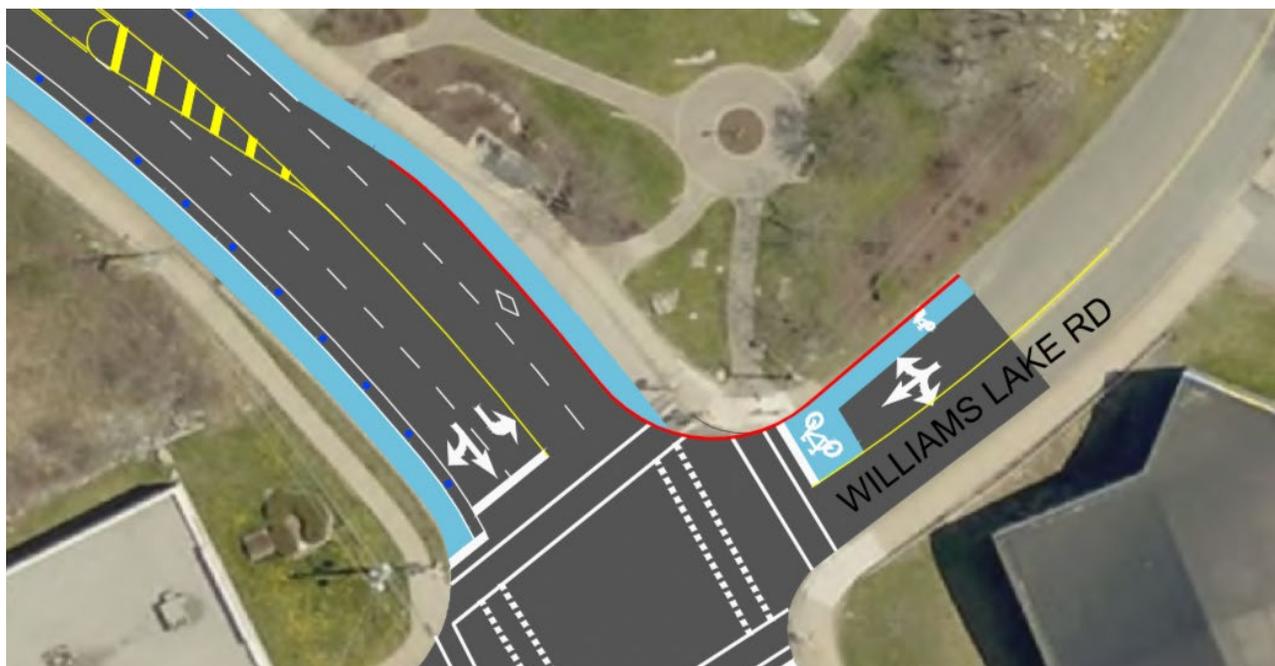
Proposed intersection design at Herring Cove Road and Williams Lake Road to support cycling, showing a staggered stop bar, pavement markings through intersection crossing and a bike box
